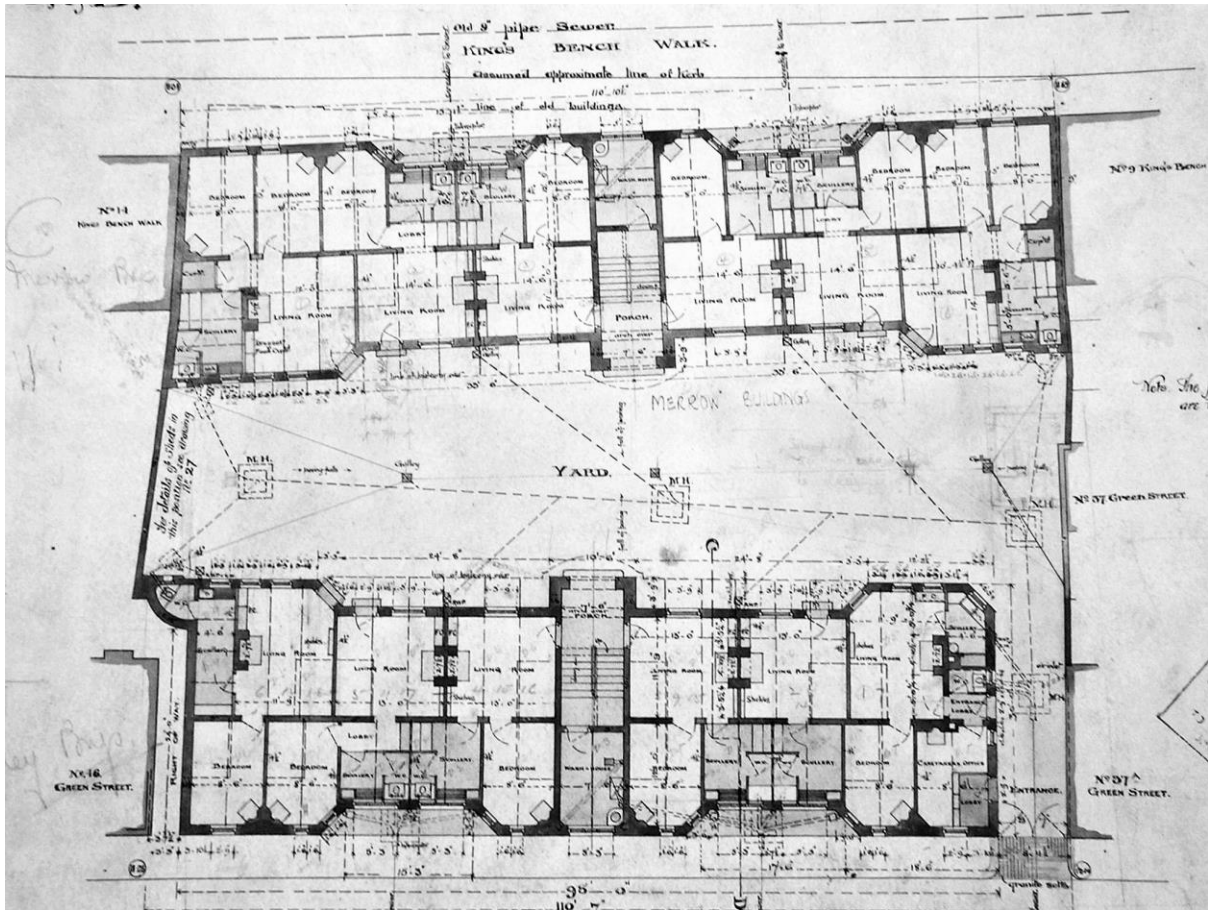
Plan of Ripley and Merrow buildings showing its courtyard design (LCC ref: LCC/AR/HS/3/41)
